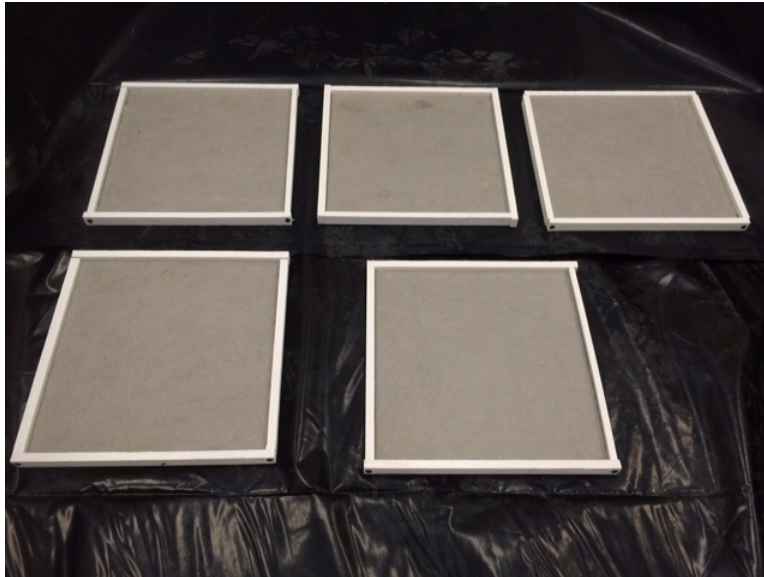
FRP Facesheet Specimens Prepared for Overlay Casting
